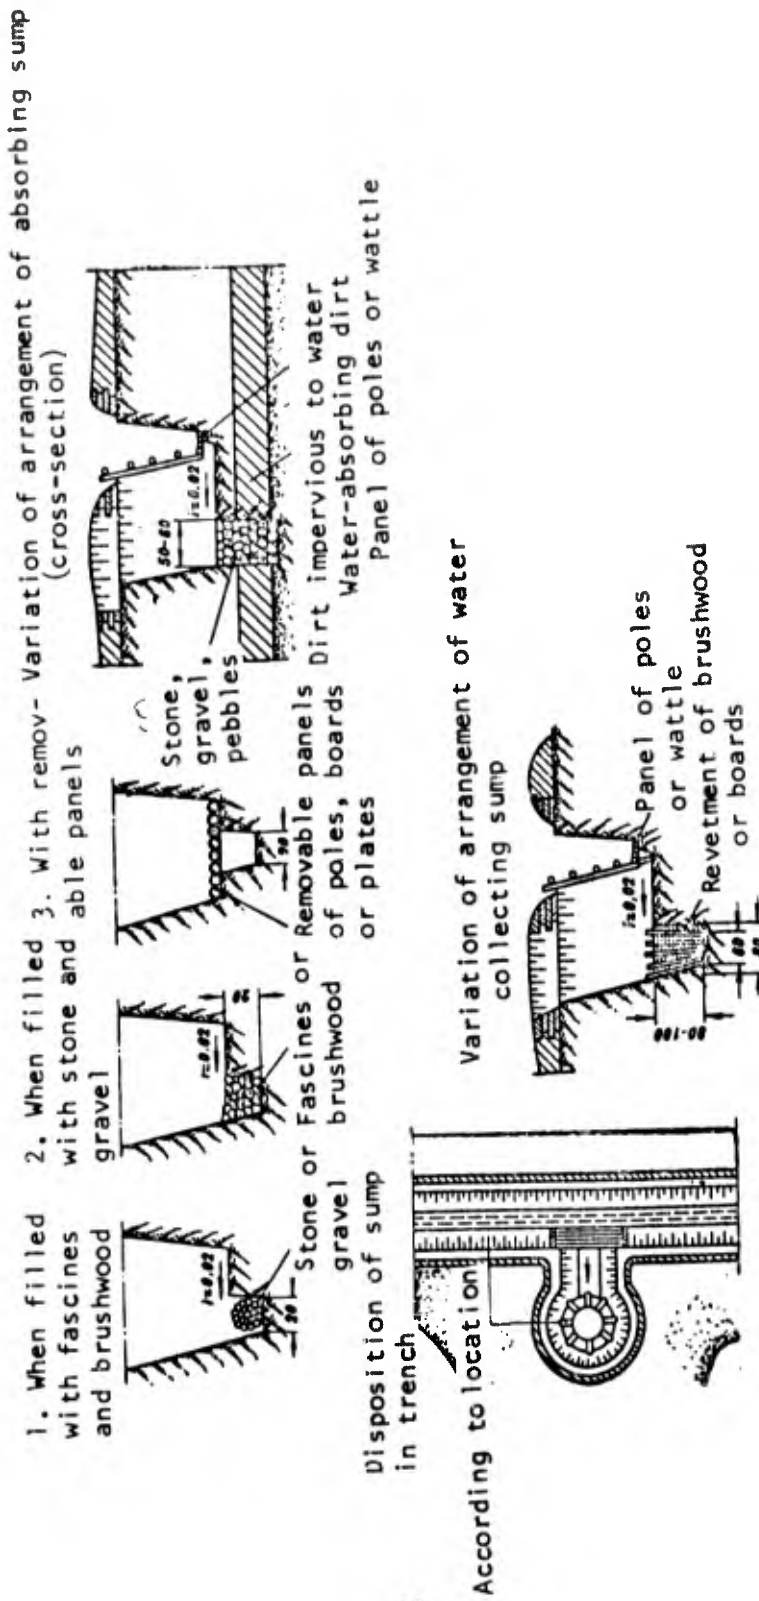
Arrangement of Sumps and Ditches to Dry Trenches.
